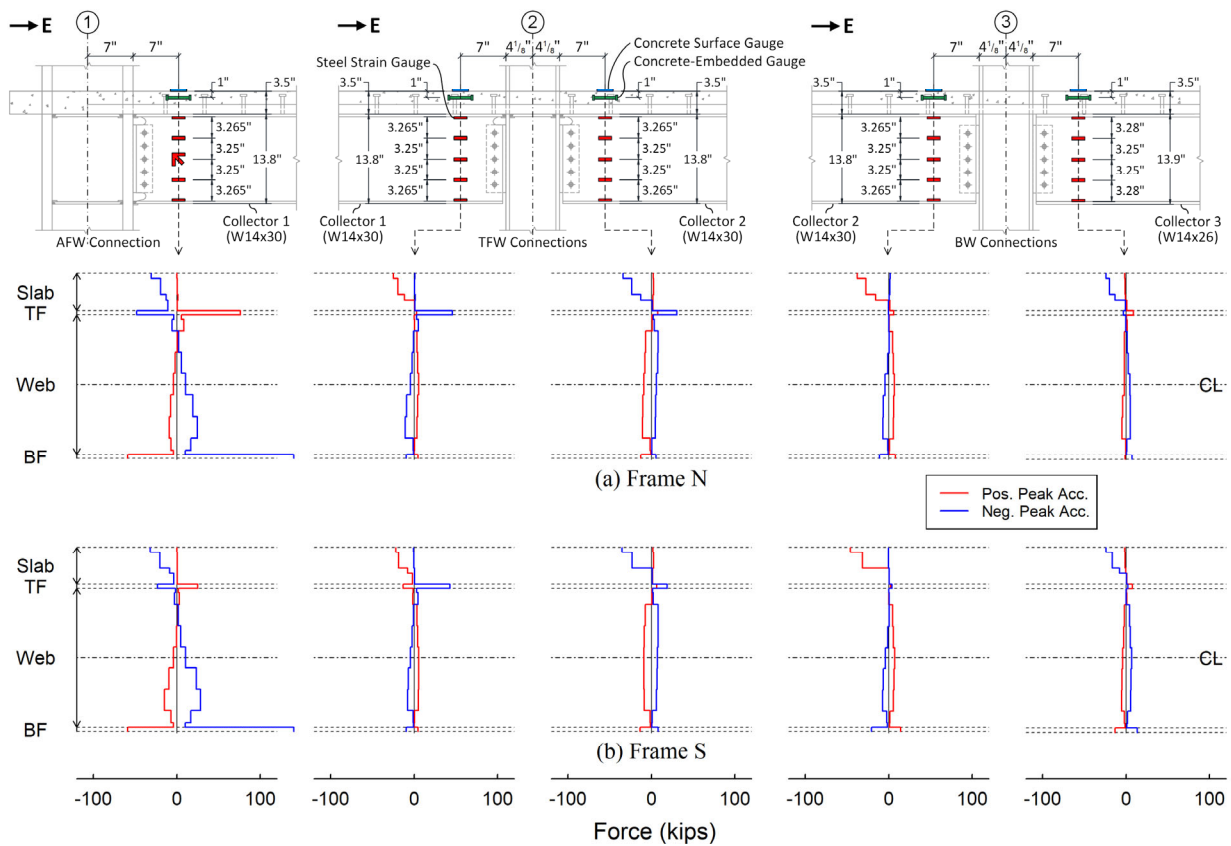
Test 2B-5: Fiber Axial Force Profiles of 2<sup>nd</sup> Floor Collector Connections
